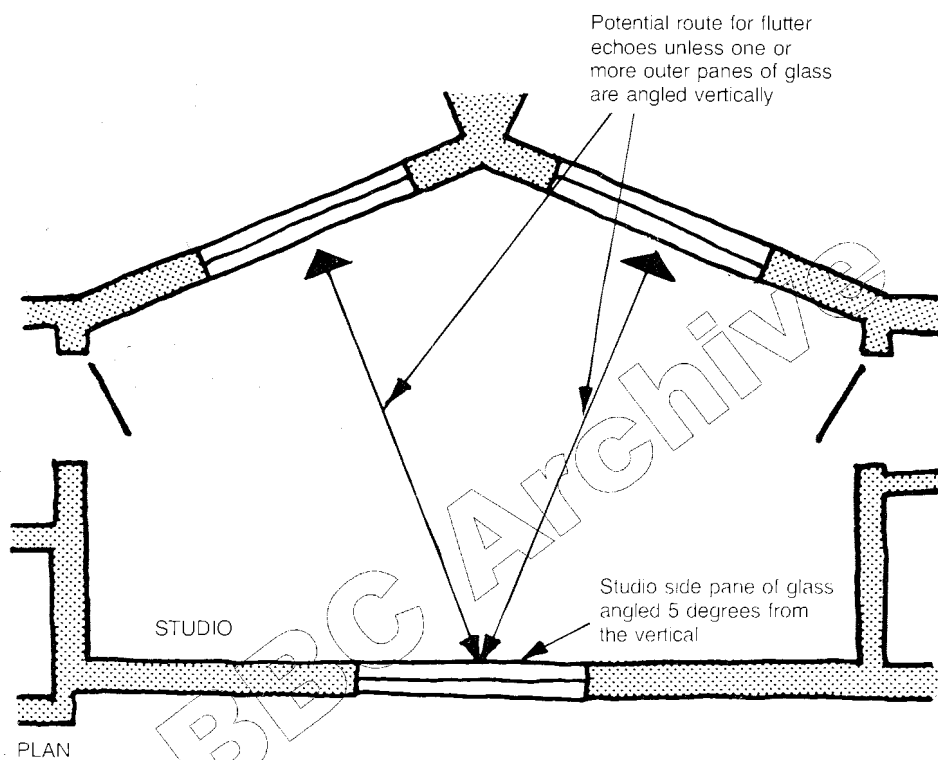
Typical Plans and Section showing Principles of Angled Windows to avoid Flutter Echoes
